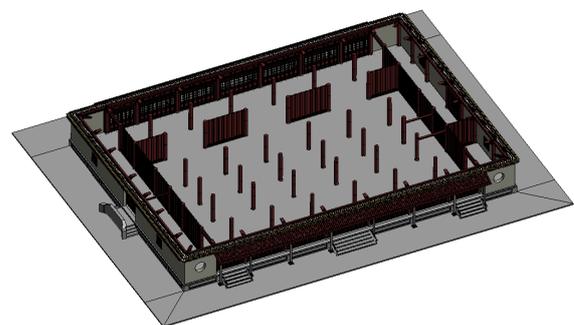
Sectional View Showing Column Structure, Wall, Multi-level Steps in the Thái Hòa Hall HBIM 3D Model (Revit)
